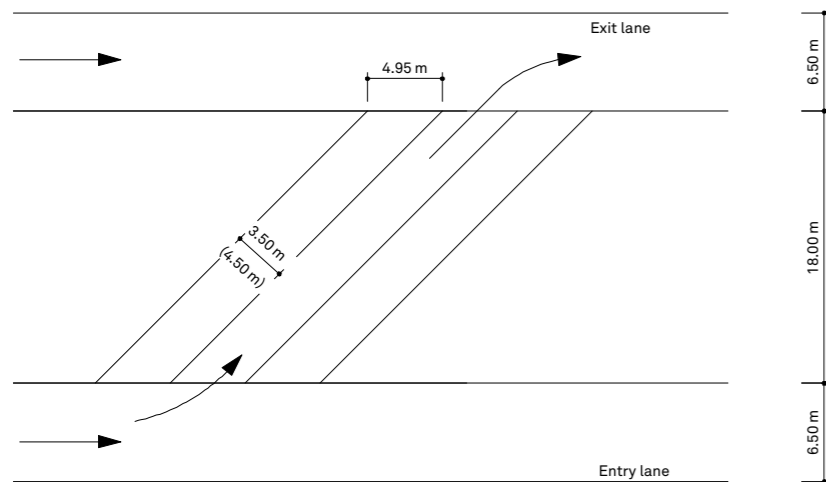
Basic dimensions for truck and bus parking – angled spaces
